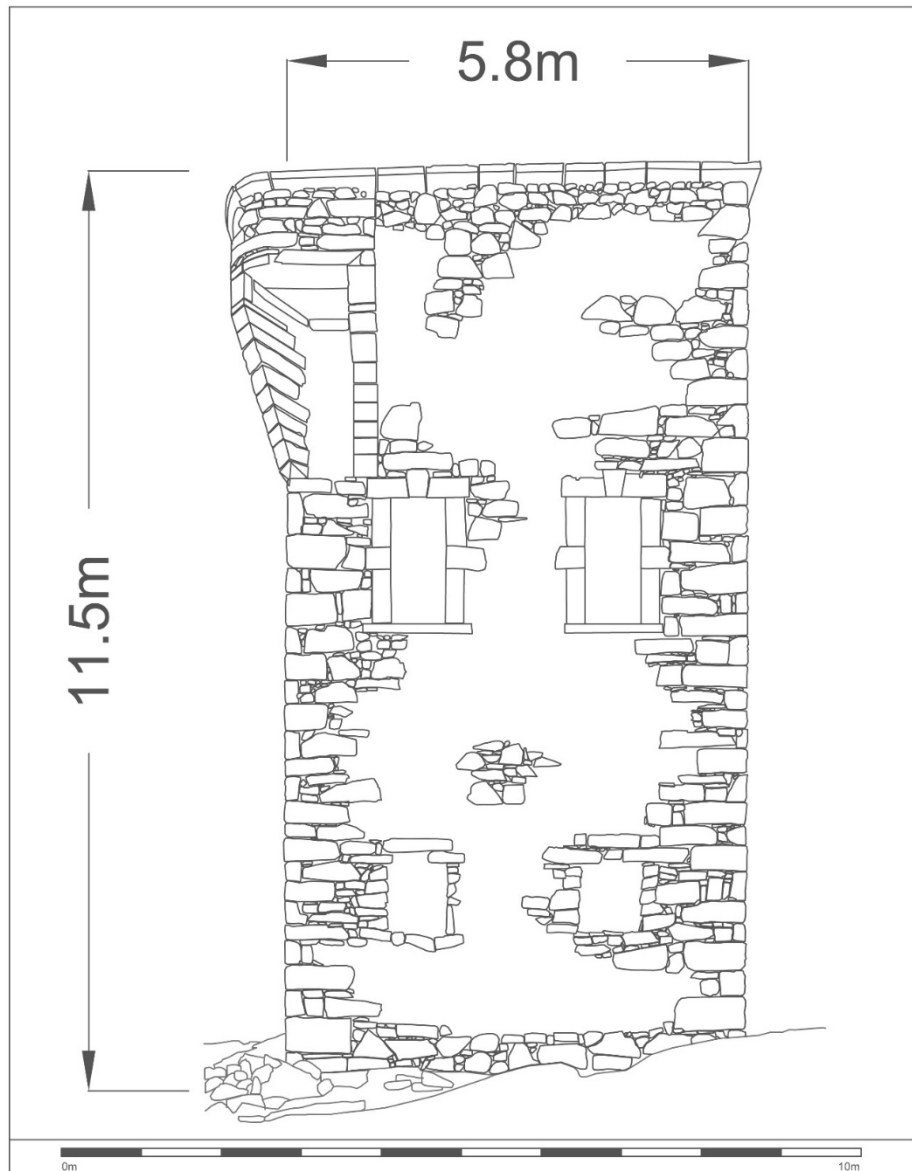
External elevation of the north-west wall of the signal tower at Golam Head Signal Station.
